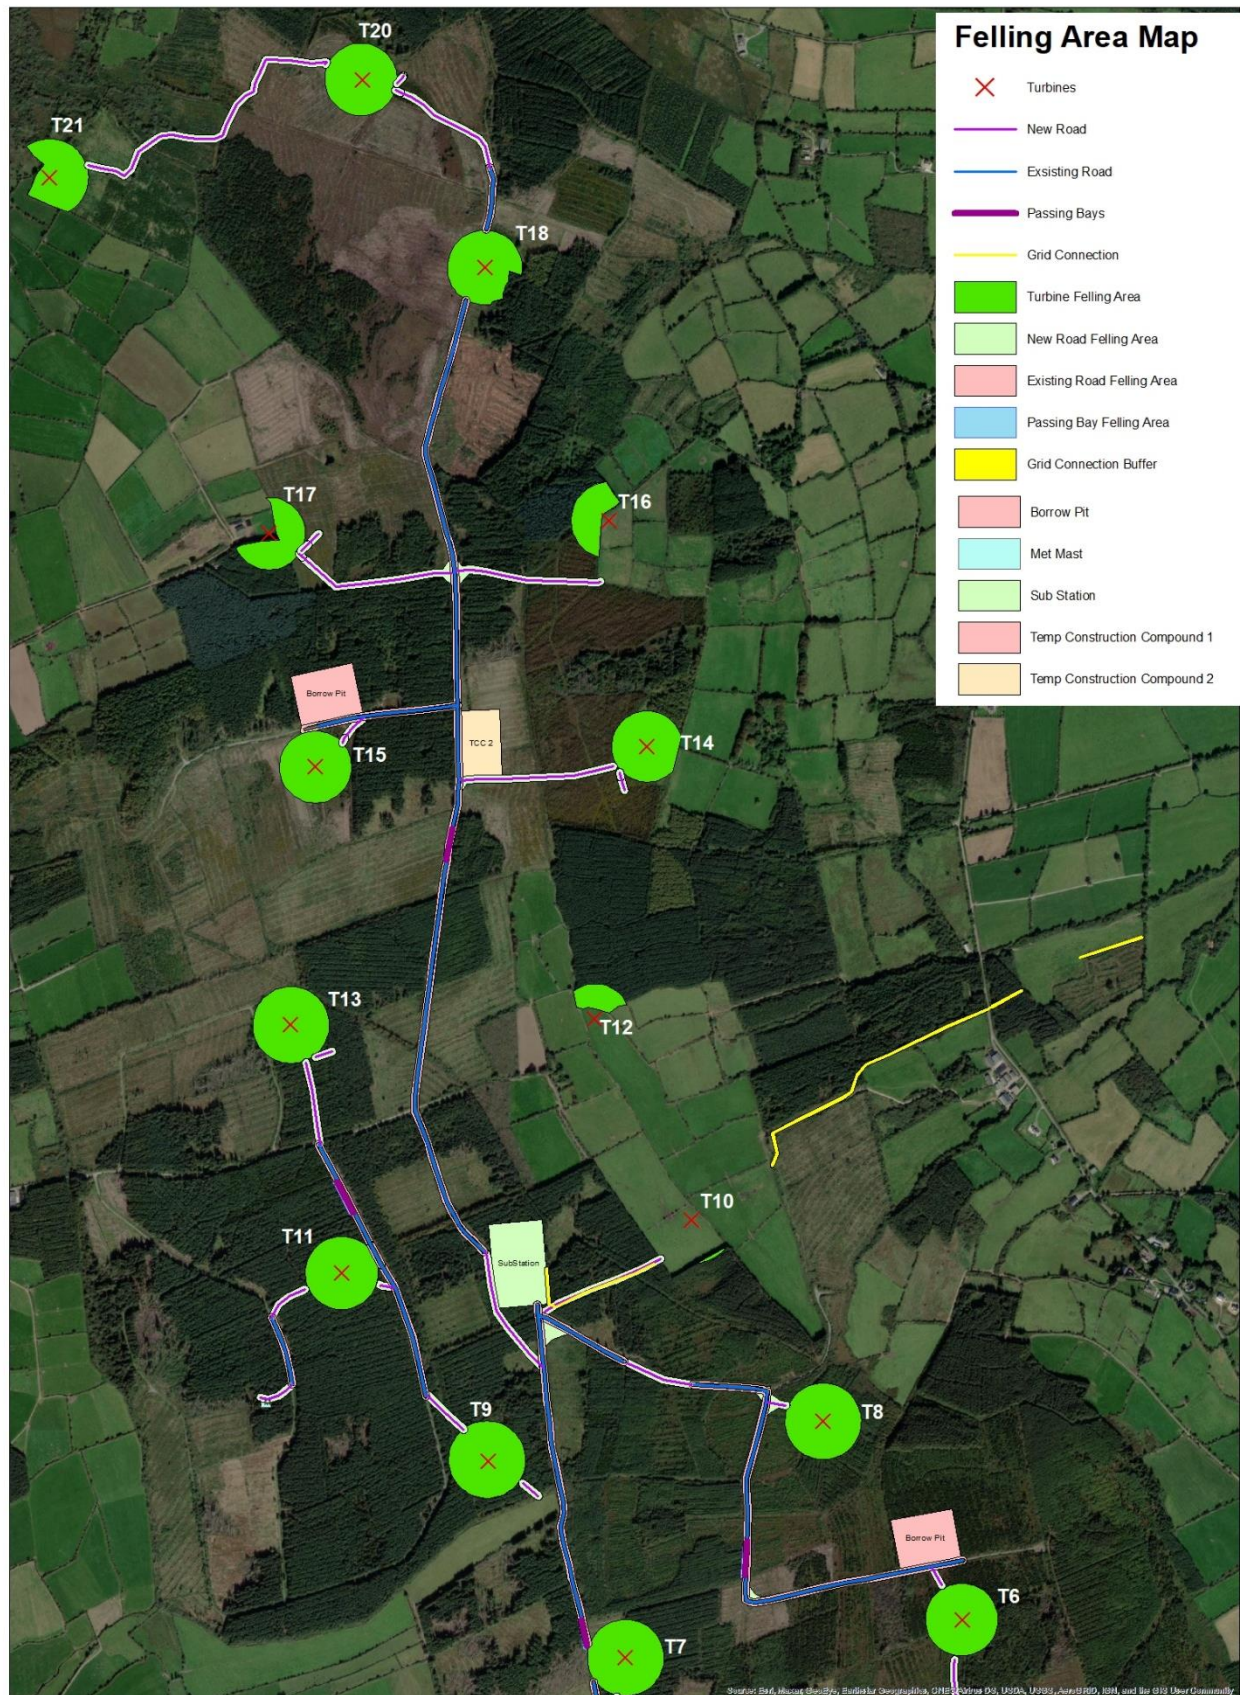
Forest areas to be felled for Turbines 6 – 18 and 20 – 21, borrow pit, mast, substation, passing bay, temporary construction compound, corner widenings and new roads.
